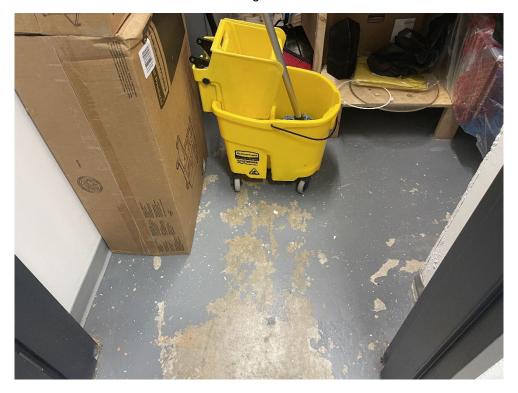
Photo of the concrete slab in a storage room of the Site's cellar.
